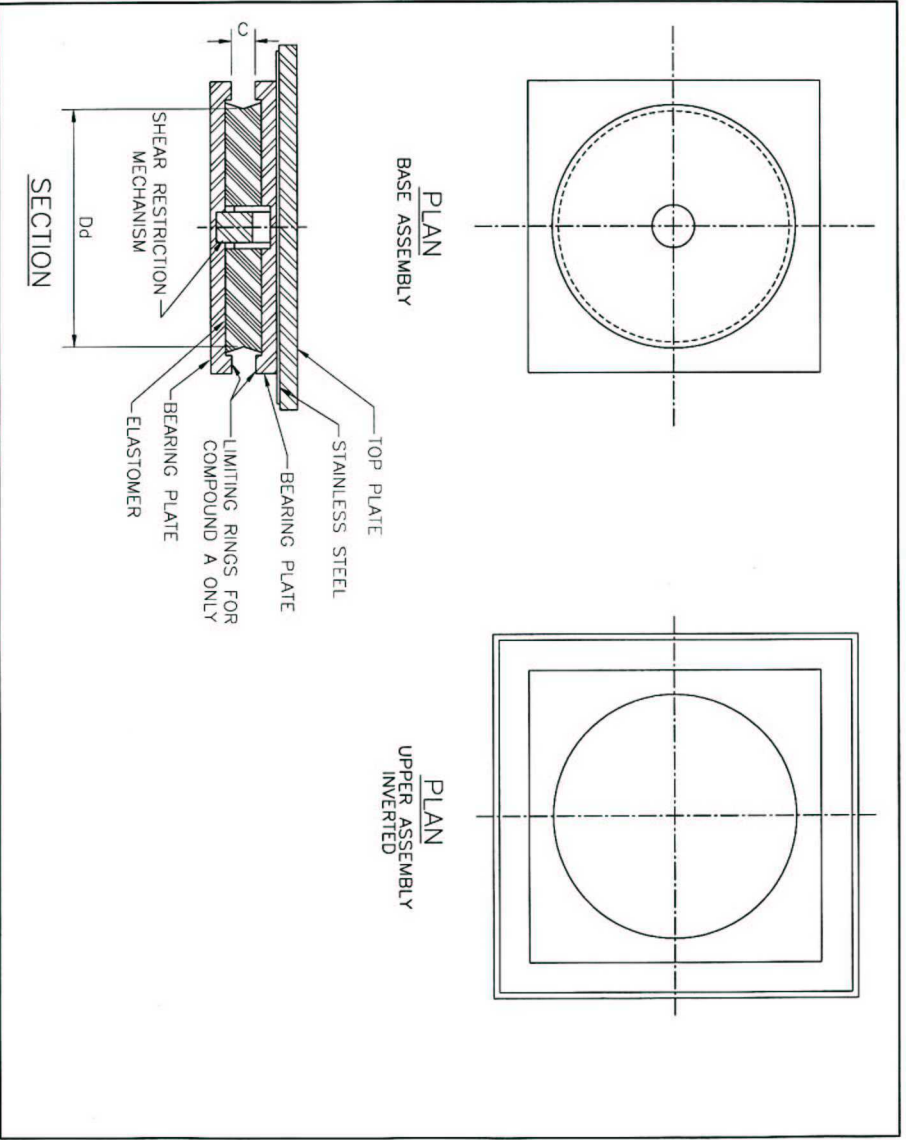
NON-GUIDED EXPANSION DISC BEARING
